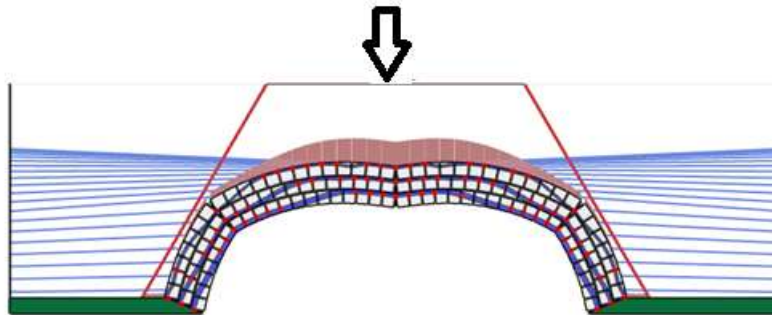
Collapse mechanism for arch loaded by 2 m square footing, column position at arch mid-span
